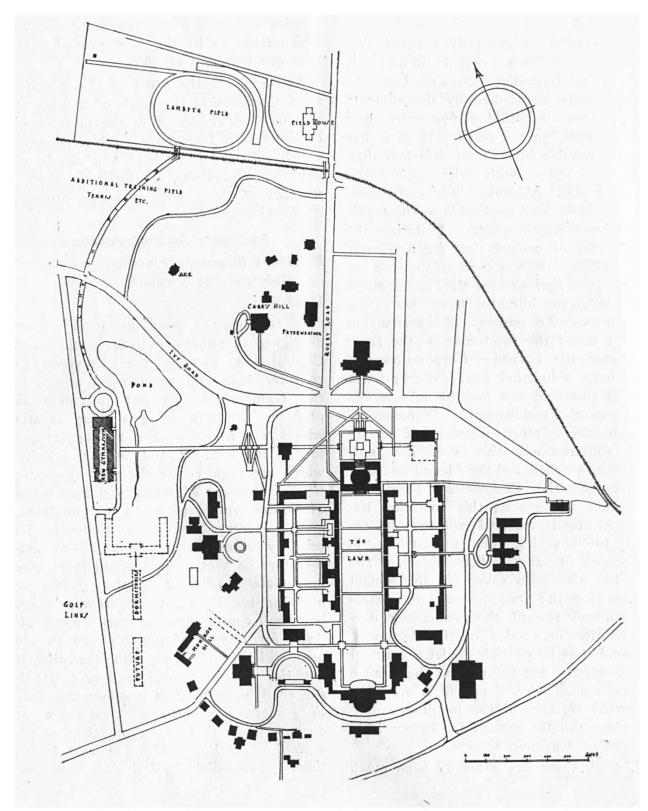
The Architectural Commission recommended a site for the new gymnasium to the "west of the present ice pond on the plateau between it and the public road as seen in this 1921 plan. (R-JAV-AL-AN-1921-LH1_V6A5-M-MemGymLocationMap.jpg)
